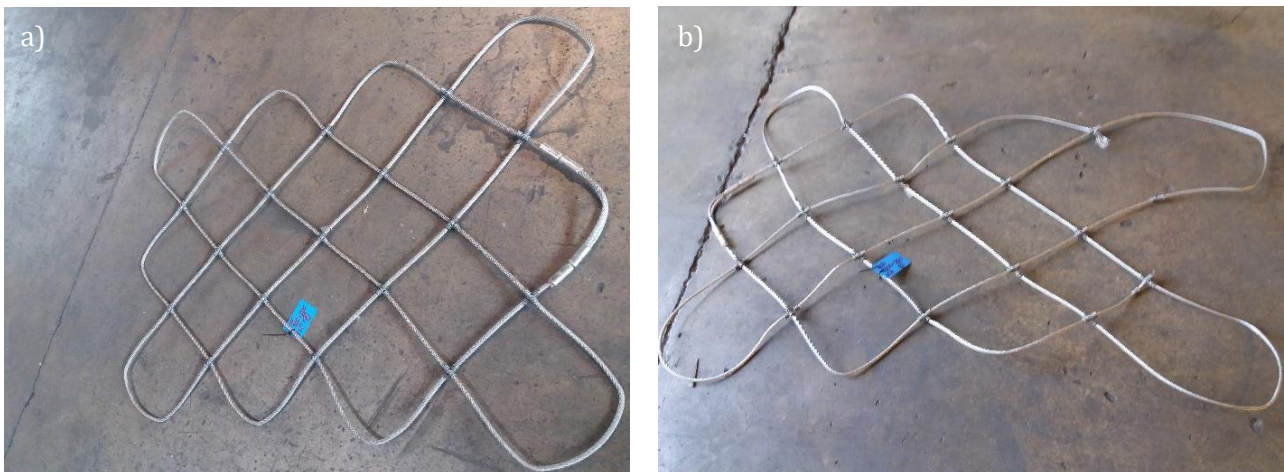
Tested SW panel; a) Specimen before test and b) Specimen brake due to loading process
